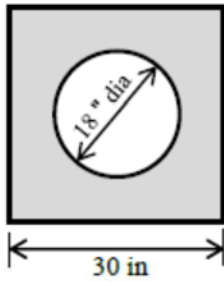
Voided 30-inch-Square Prestressed Concrete Test Pile
